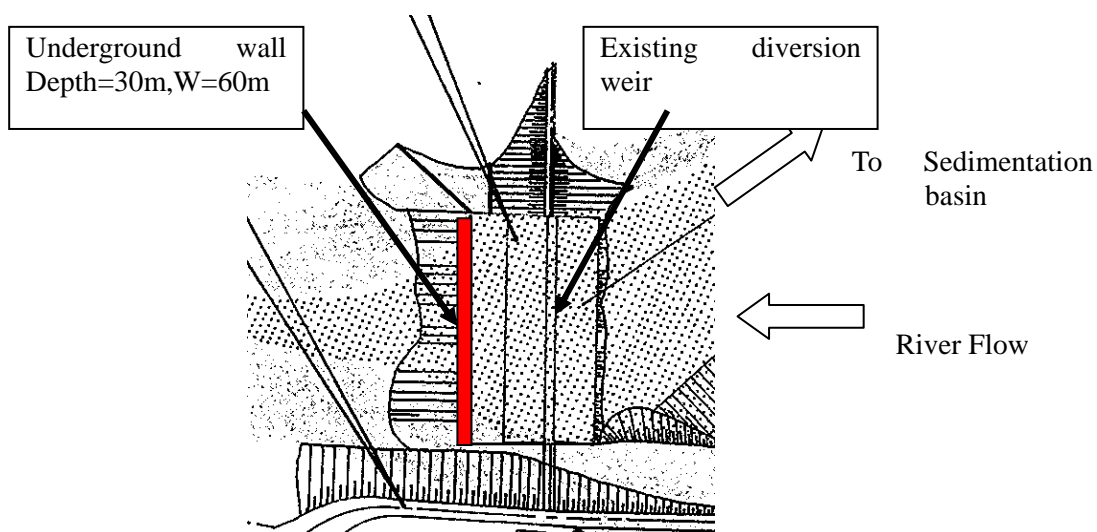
Jaclupan Conversion Weir and new underground wall location
